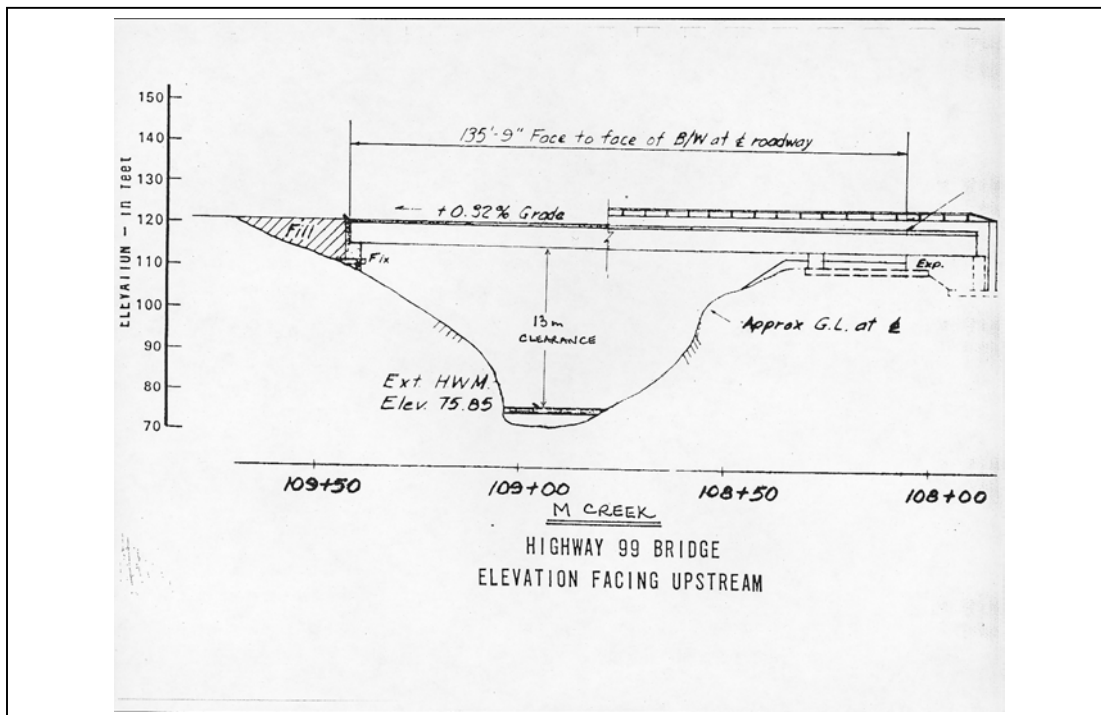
Elevation view facing upstream of the replacement Highway 99 bridge over M Creek, with 13 m of clearance (from Thurber Consultants 1983).
